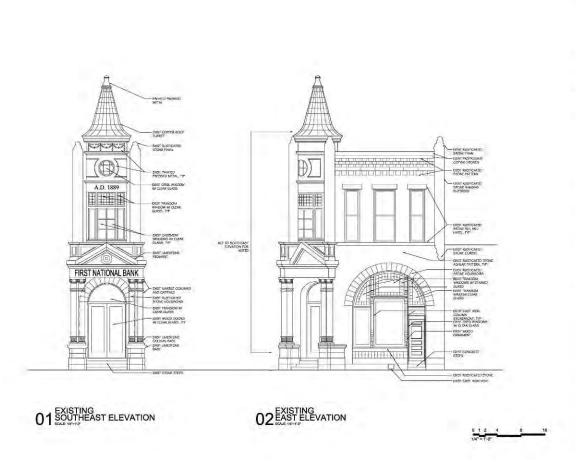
Existing Southeast Elevation and East Elevation (prior to 2014-2015 rehabilitation)
